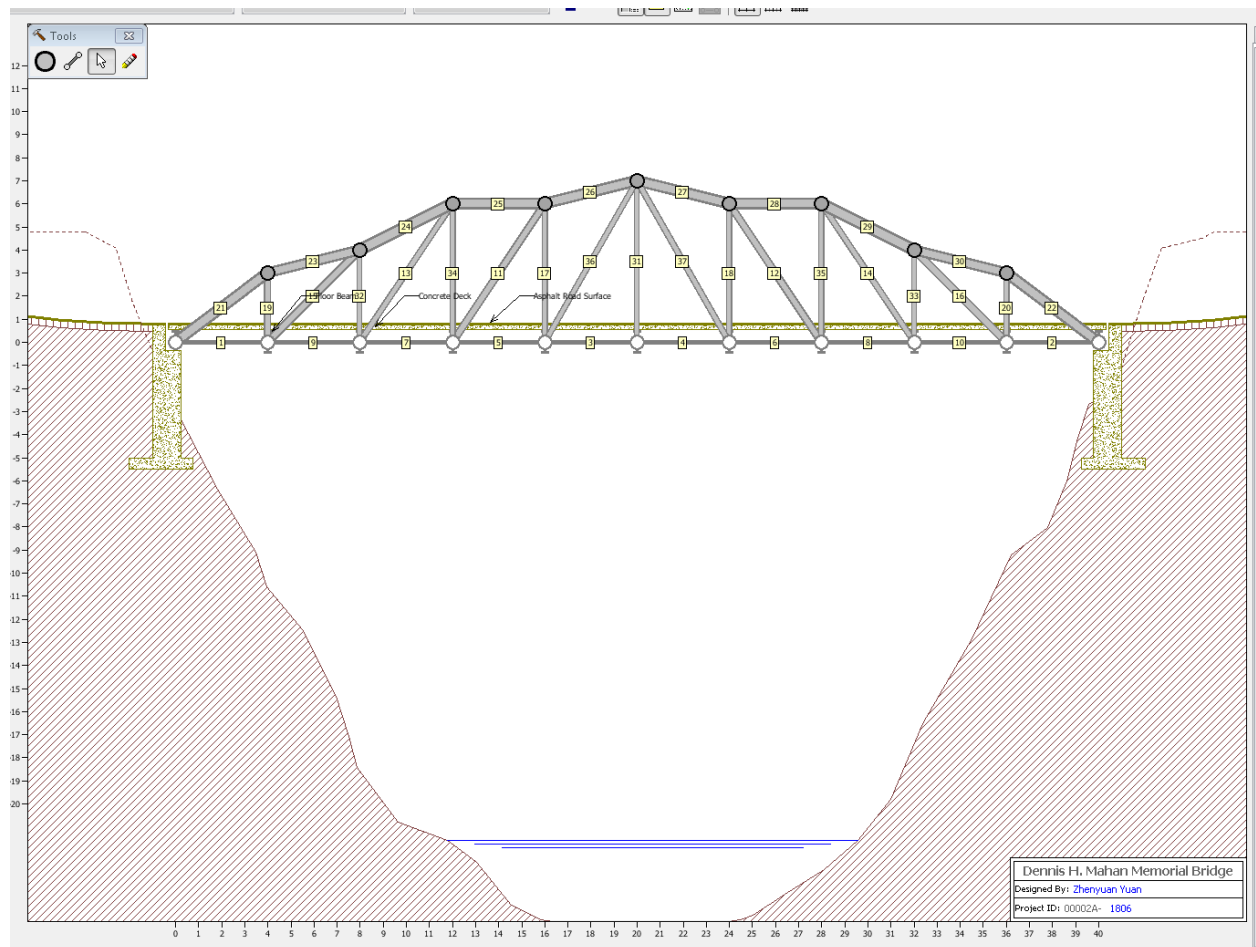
Warren Truss Bridge Model from Bridge Designer 2015
